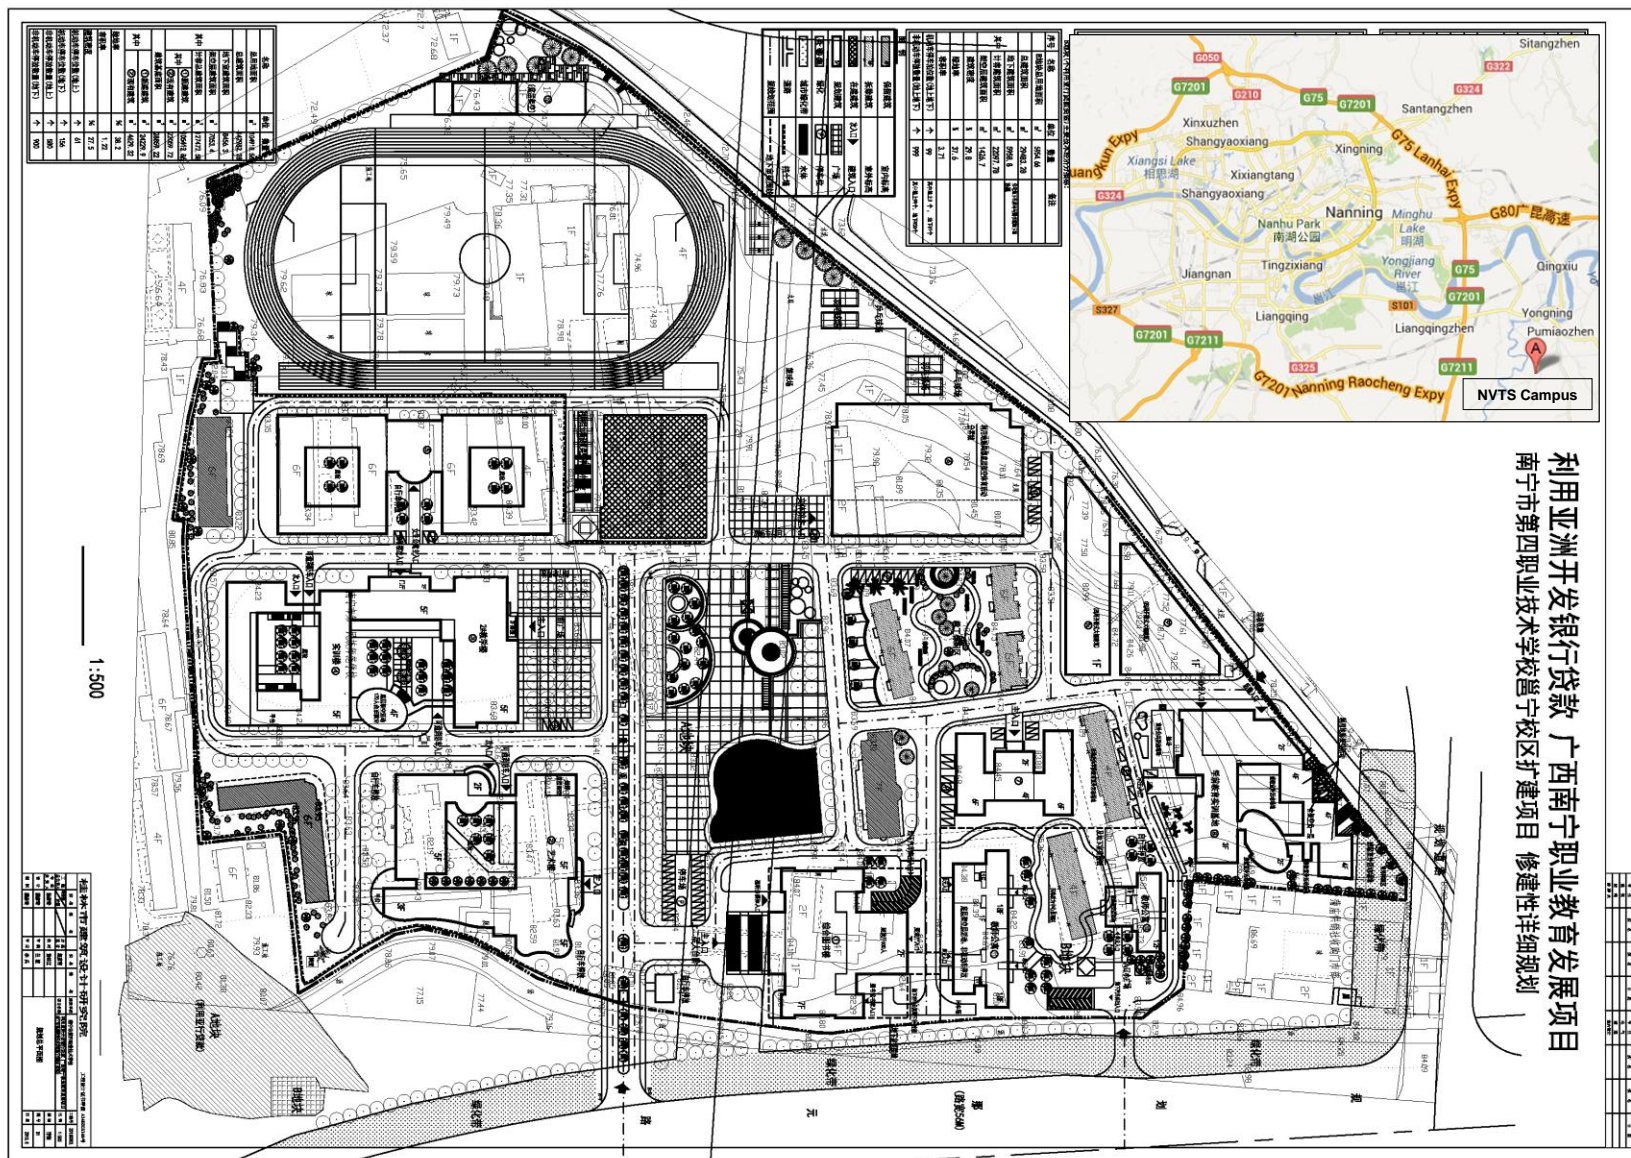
Layout of NVTs Campus and Facilities Financed by Project
